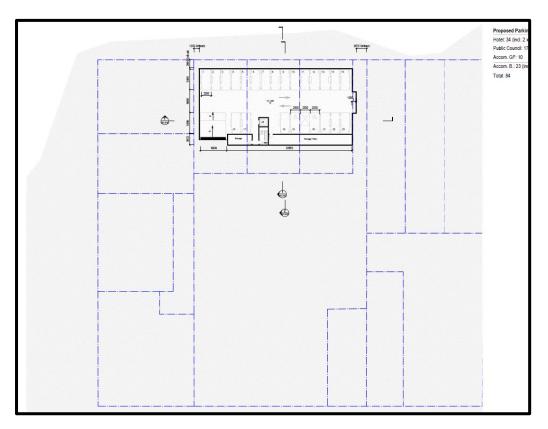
Basement floor plan of the proposed development (Source: H&E Architects).
